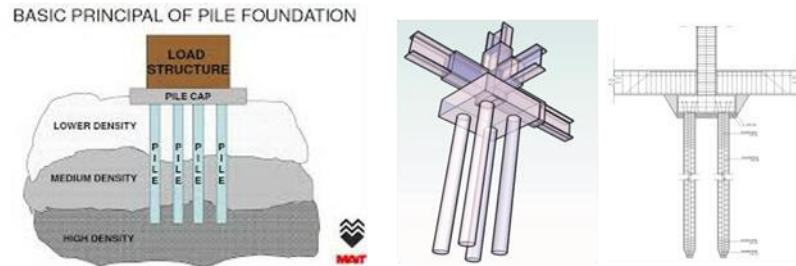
Pile Foundation (source: <https://civildigital.com/pile-foundation-classification> 2021)
